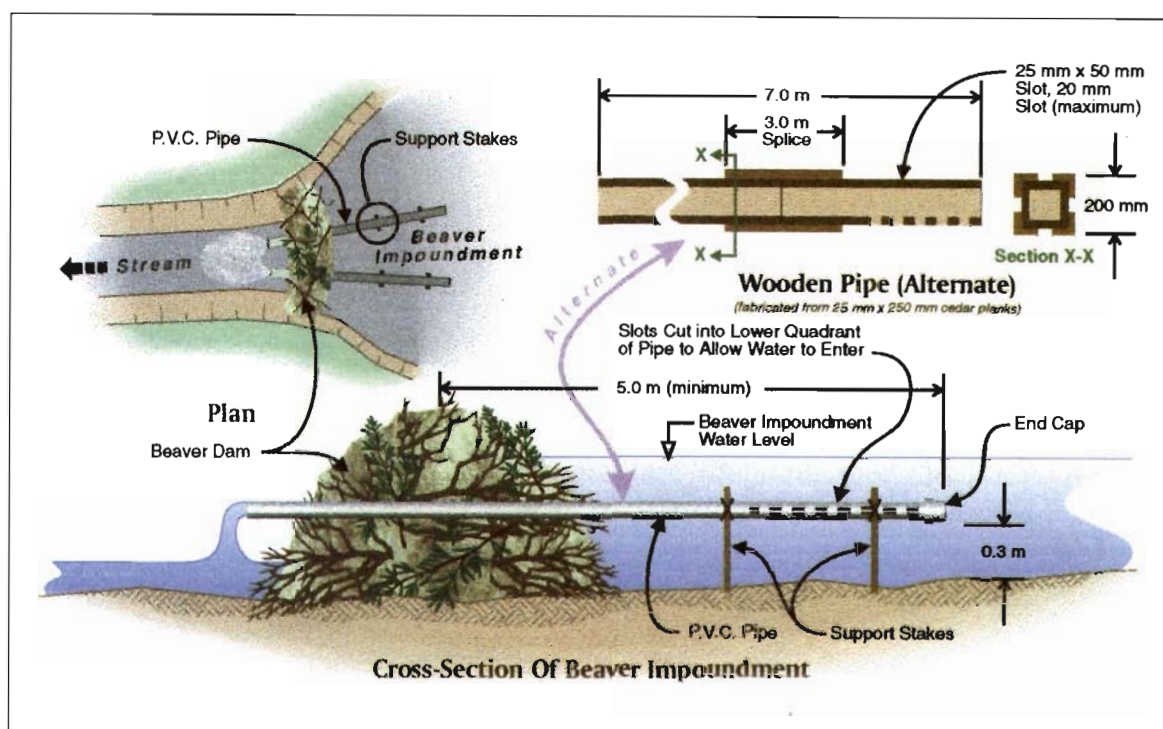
To augment low summer flows, water impounded above beaver dams can be released through a slotted P.V.C. pipe. The submerged end of the pipe must be capped to prevent beavers from intercepting the flow.
